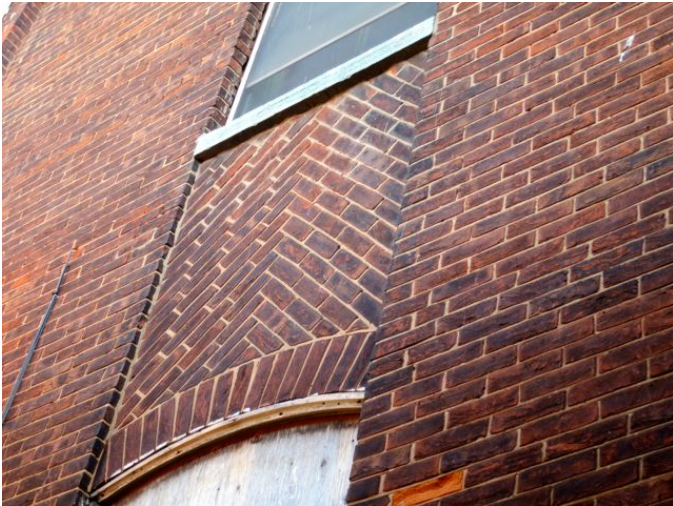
Original decorative brickwork includes herring bone panels between the 1st and 2nd floor windows.
